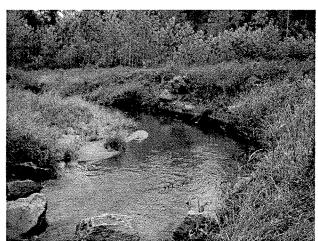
Looking downstream at log toe protection and MS Station 53+96 rock vane. (4/7/04)
